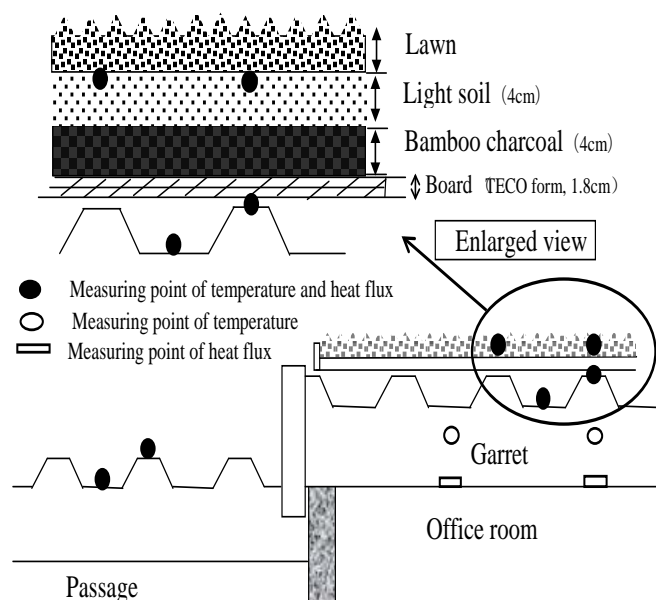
Cross-sectional schematic diagram of greening system (Bamboo TECO Garden) and locations of measuring points.
